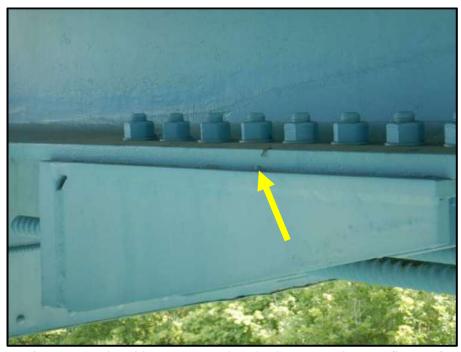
Tack welds connecting dwyidag housing to bottom flange of floorbeam 9.
